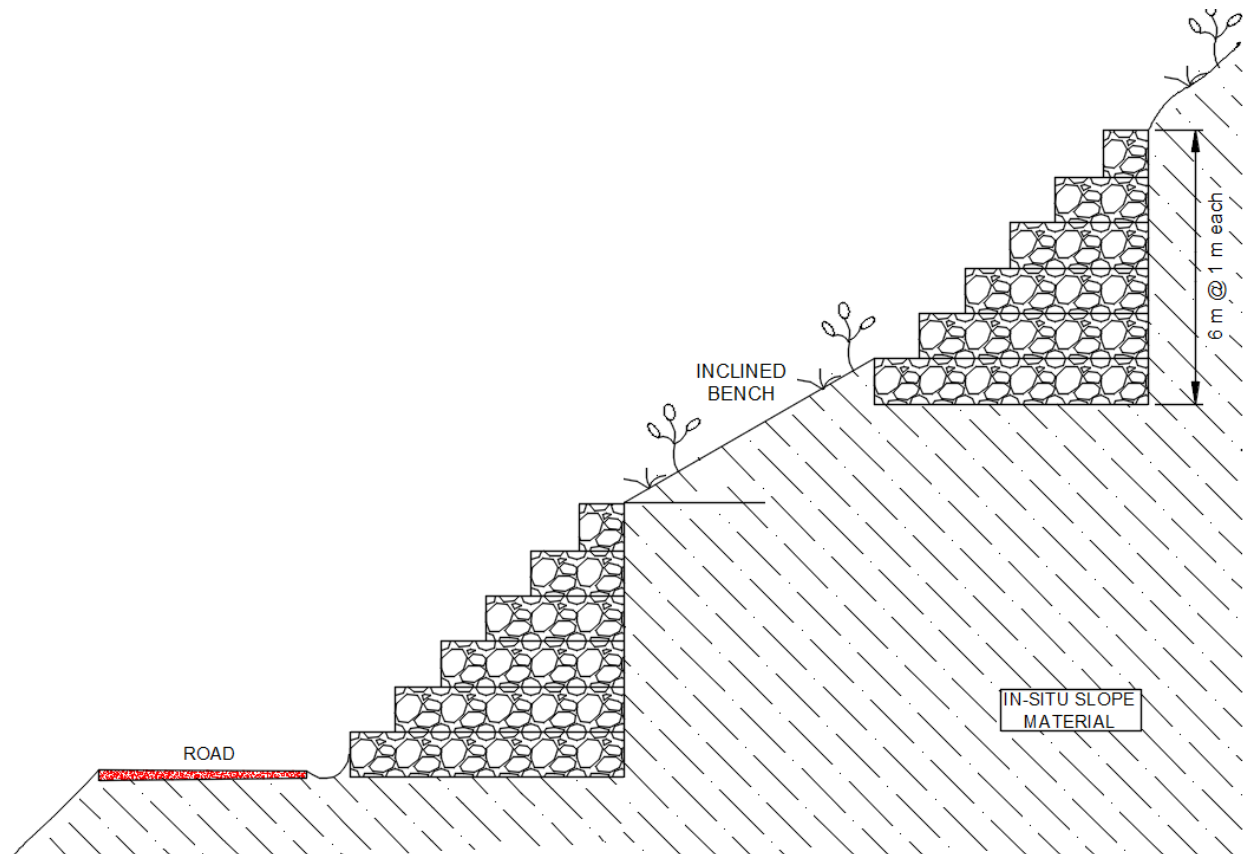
SECTIONAL VIEW OF A TWO LEVEL GABION RETAINING WALL
